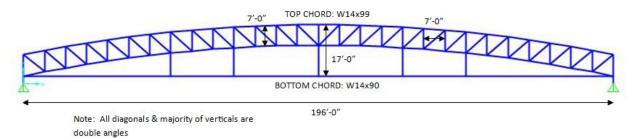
Proposed Tied Arch Truss - Preliminary Design & Member Sizes
